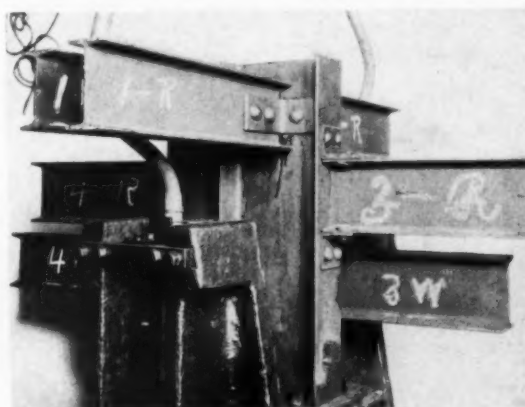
VIBRATION TEST PIECE SHOWING RIVETED CONNECTIONS
